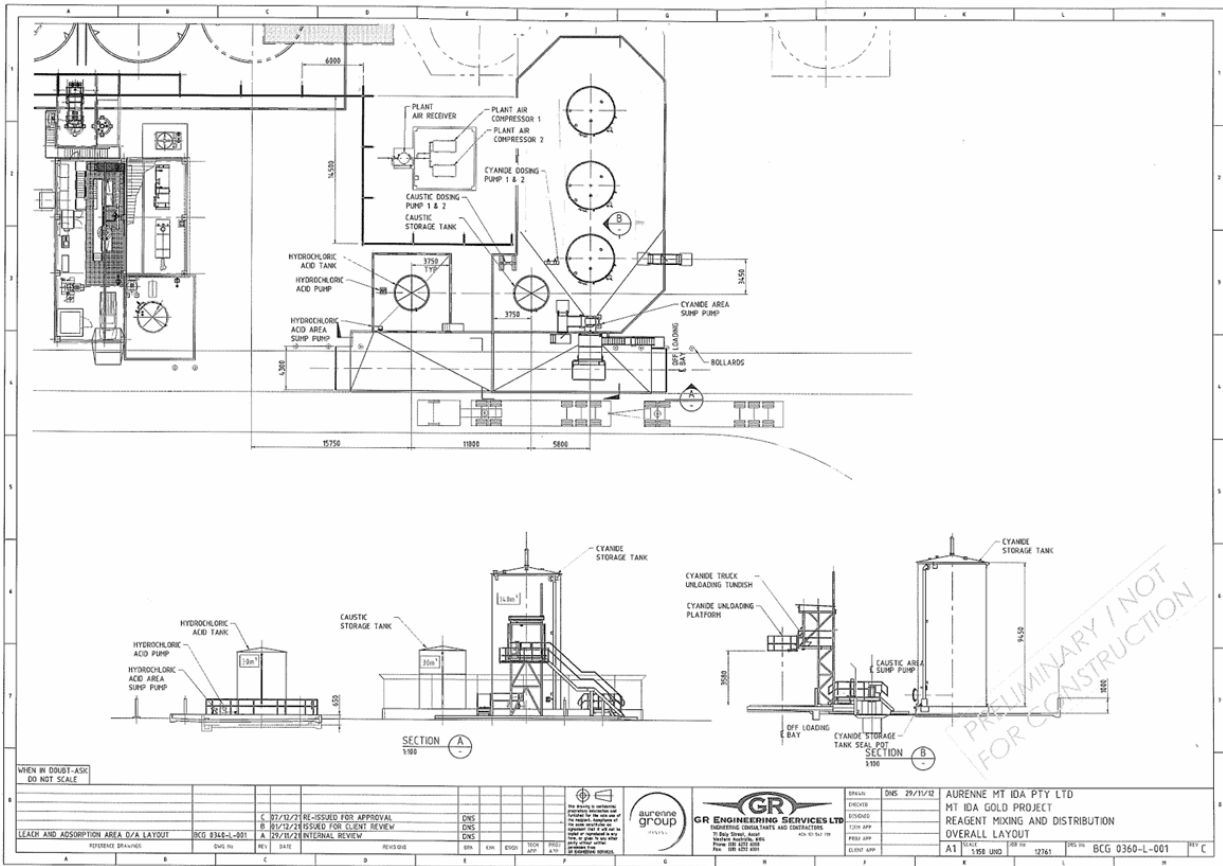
Reagent mixing and distribution layout with additional cyanide storage
